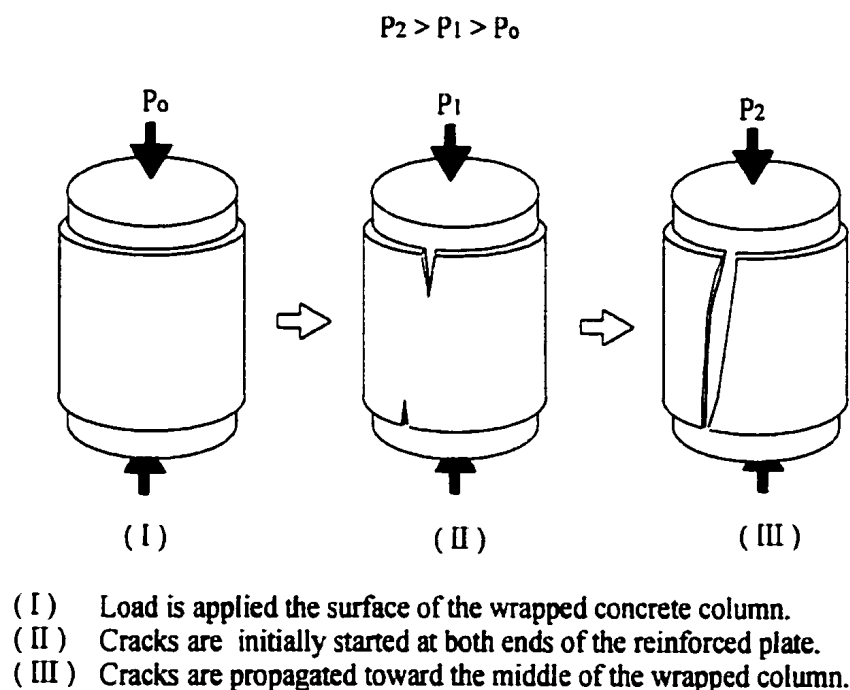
Failure mechanism of wrapped concrete cylinder subjected to compression load.
